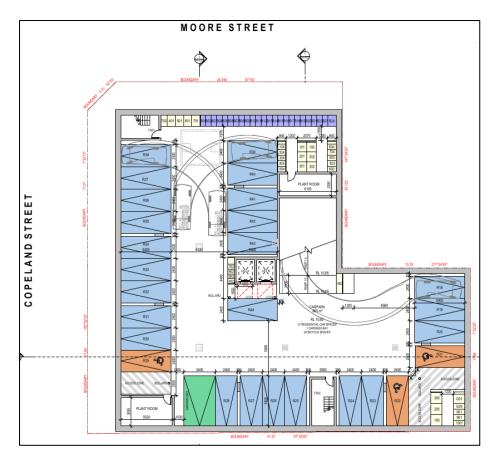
Basement Level 2 Plan Extract (Source: CDA Architects)
